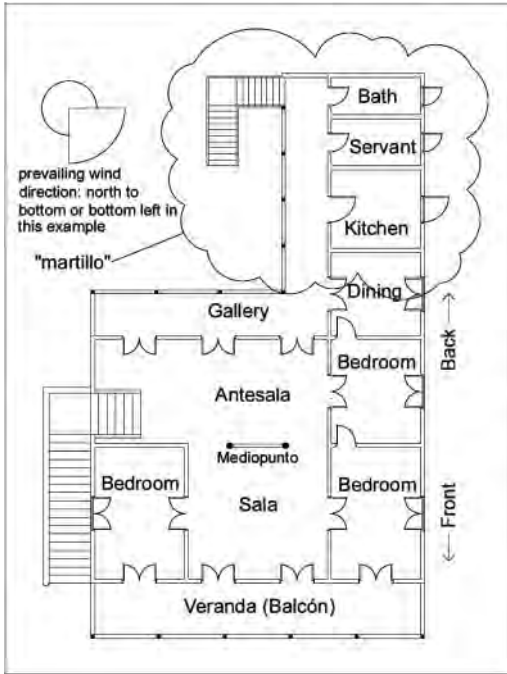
Generic diagram of a typical Puerto Rican casa criolla. The version shown would be a second storey over a commercial ground floor (Drawing by author).
